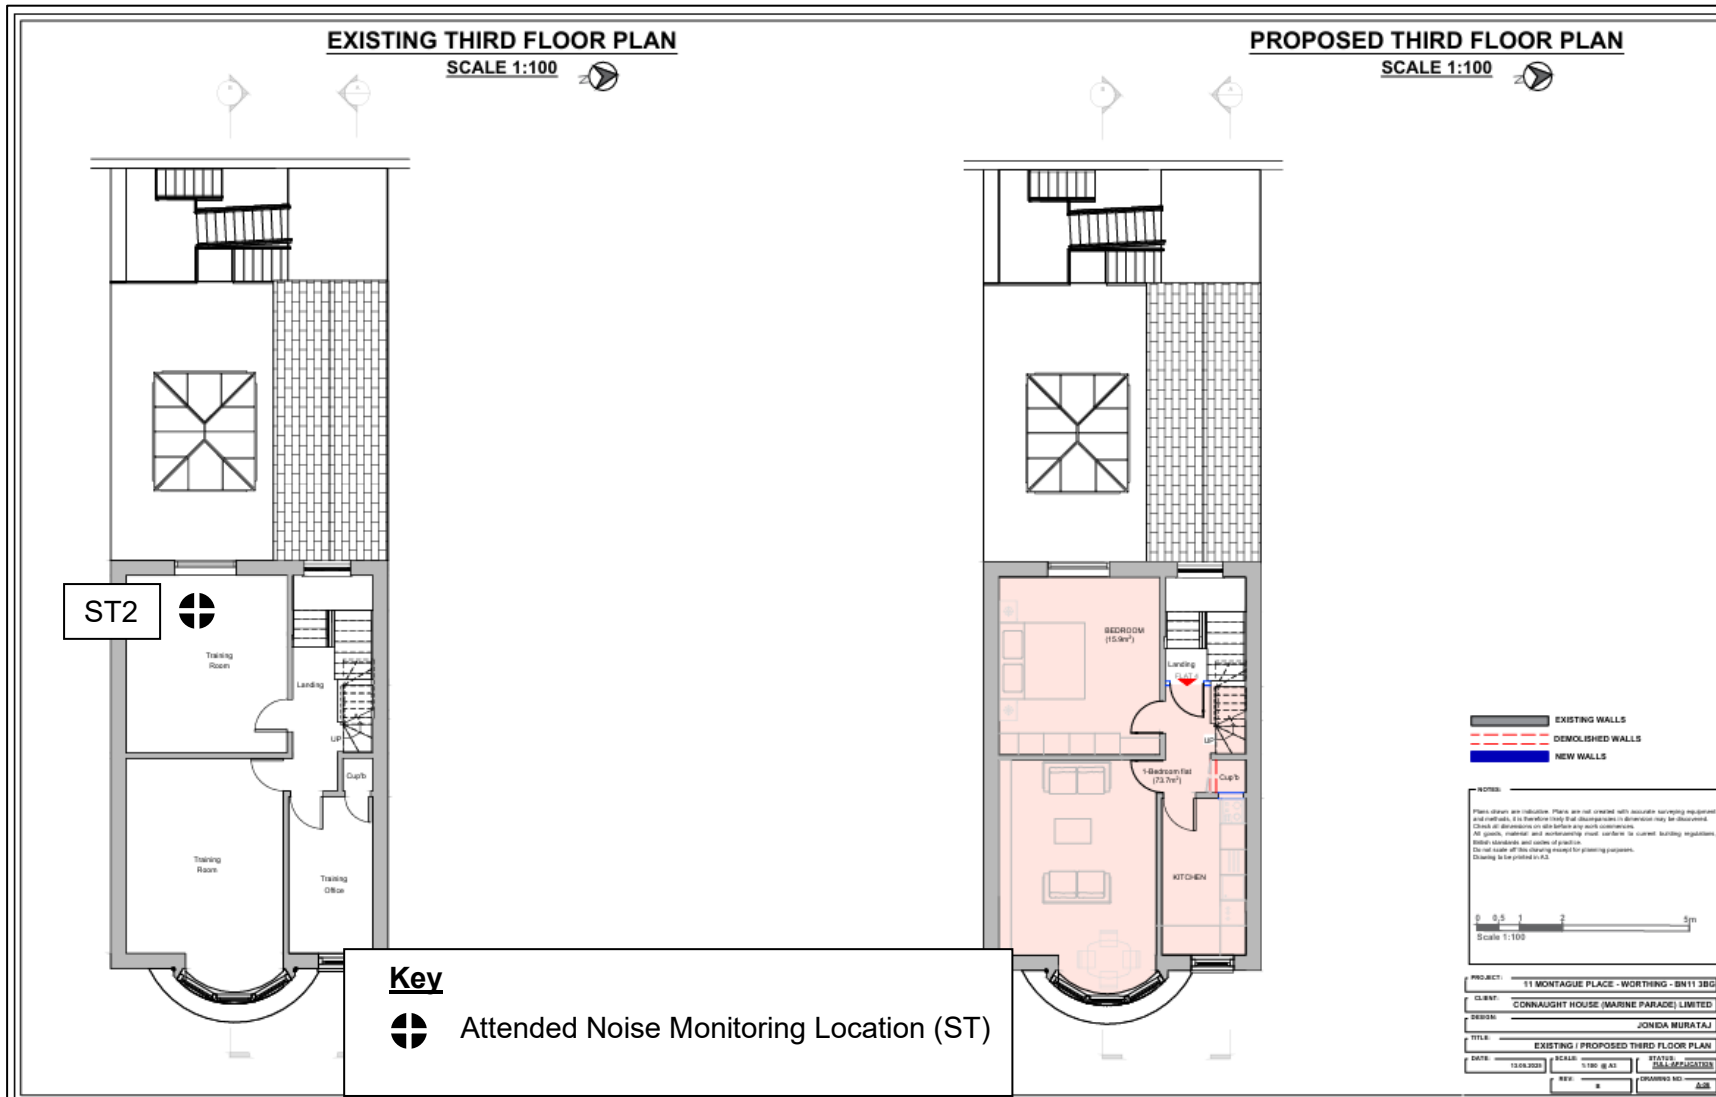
Existing and Proposed Site Floor Plans – Third Floor
